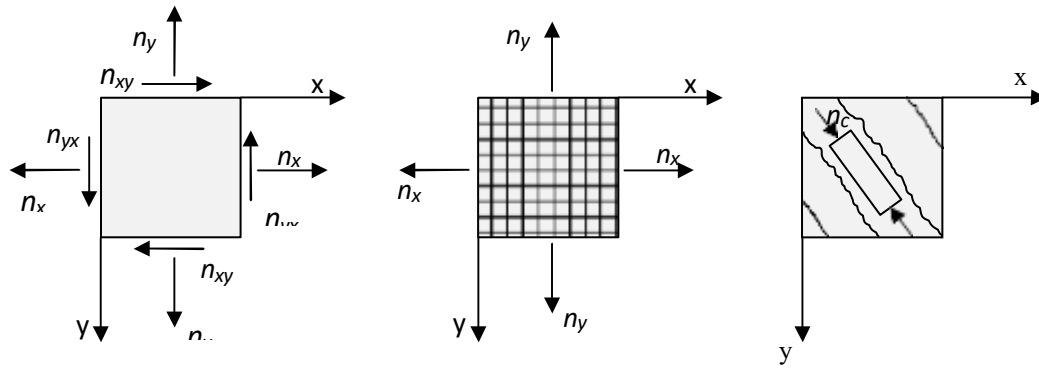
Stress resultants in a 3D-membrane element, resulting reinforcement forces and compressive strut in concrete.
